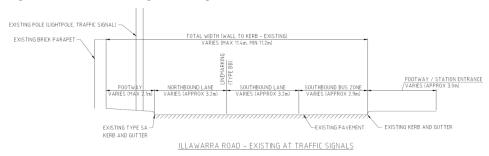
Cross section of the existing lane configuration of Illawarra Road at Marrickville
